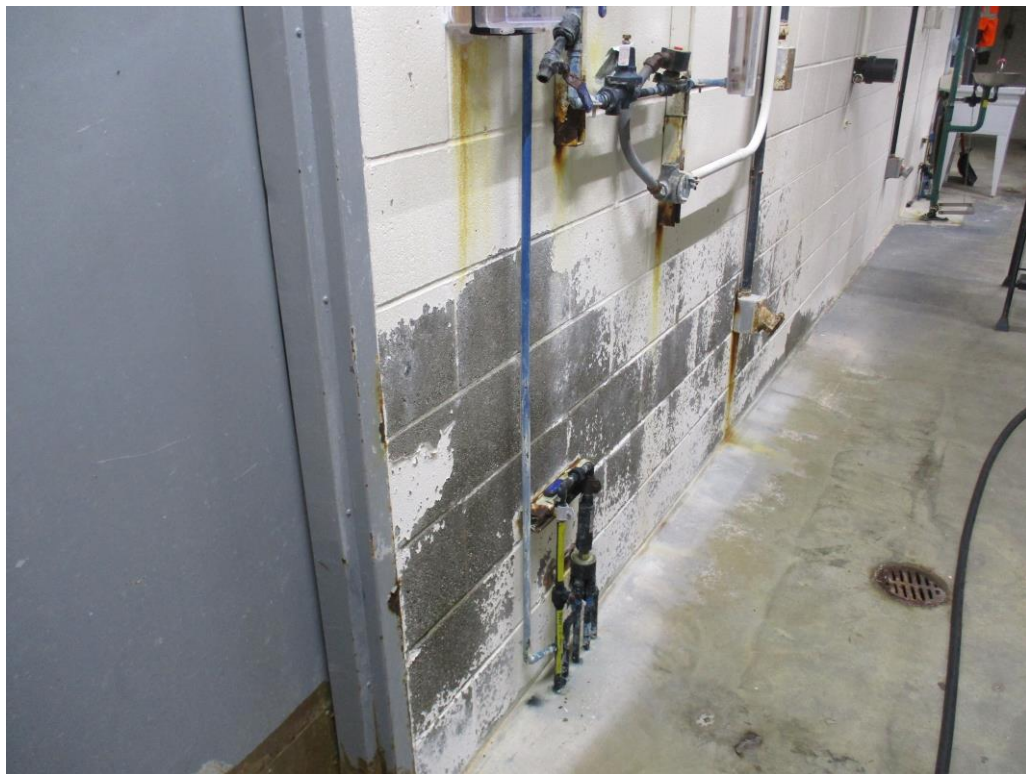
Corrosion of Metal Pipes in Process Building (Upper Floor)
